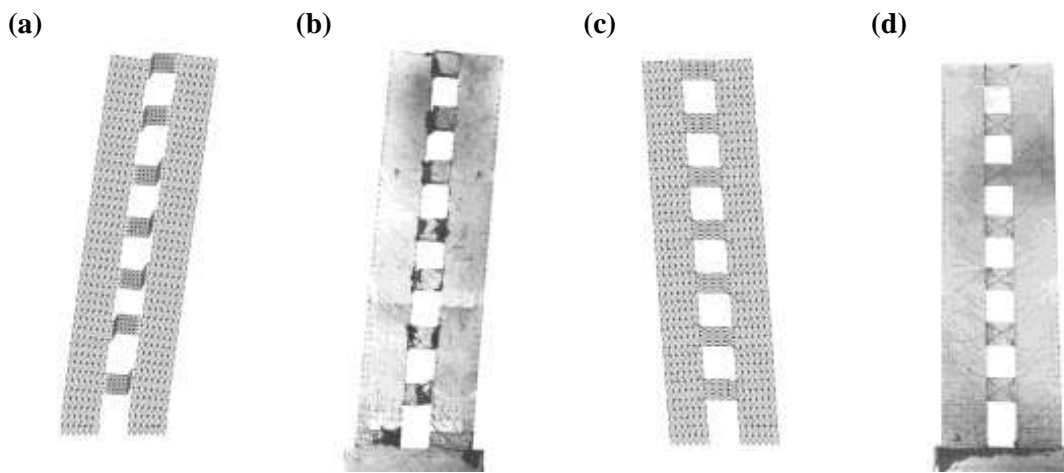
(a) Deformed shape of model Wall A at maximum displacement (2x). (b) Wall A after the test. (c) Deformed shape of model Wall B at maximum displacement (2x). (d) Wall B after the test. Deformed shapes generated using STKO (Petracca et al. 2017a, Petracca et al. 2017b) and pictures from Santhakumar (1974).
